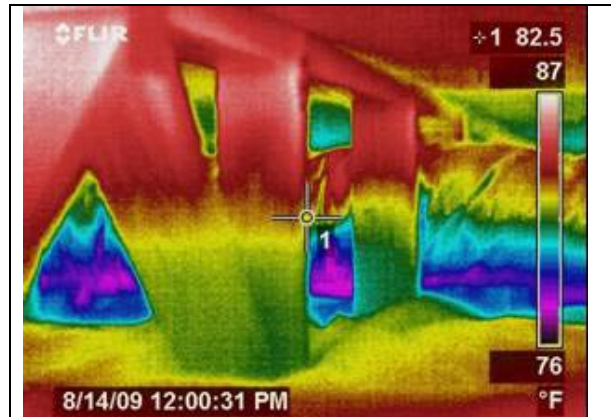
IR image inside a 2nd story floor cavity open to a hot attic shows thermal stratification (House 16). (Image credit Withers)
